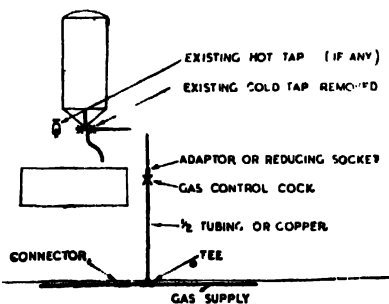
Installation of water heater with integral taps directly over sink. Cold tap over sink is removed but existing hot tap is left intact.
